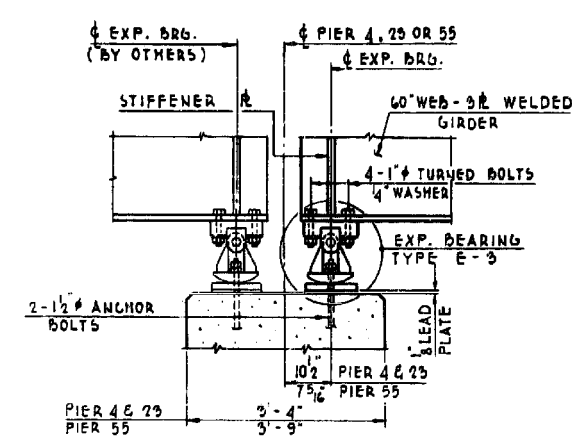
DETAIL 'A' SCALE: 1/2" = 1'-0"
